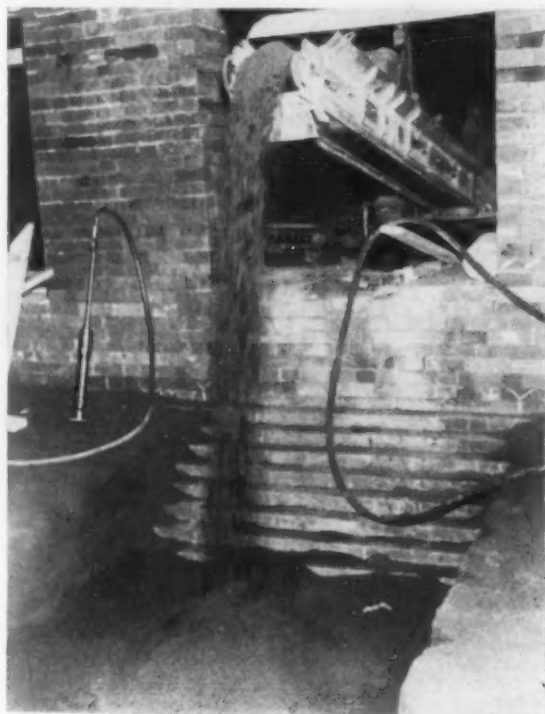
Conveyor pouring mix for center section into the furnace. Ramming is continuous until complete.
